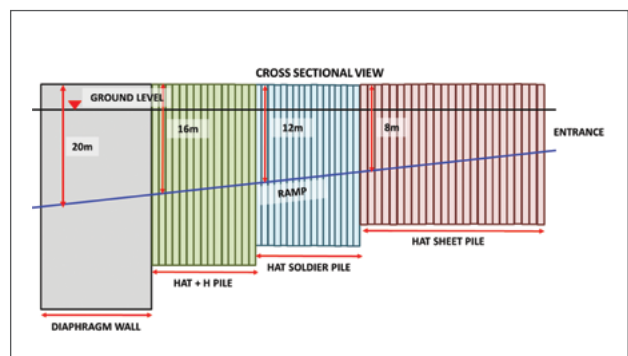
The Hat series can be used for an underground ERSS (temporary wall).
